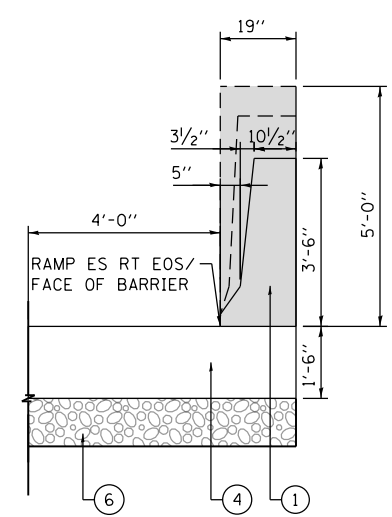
DETAIL "A" AND DETAIL "B": ELEVATION VIEW
